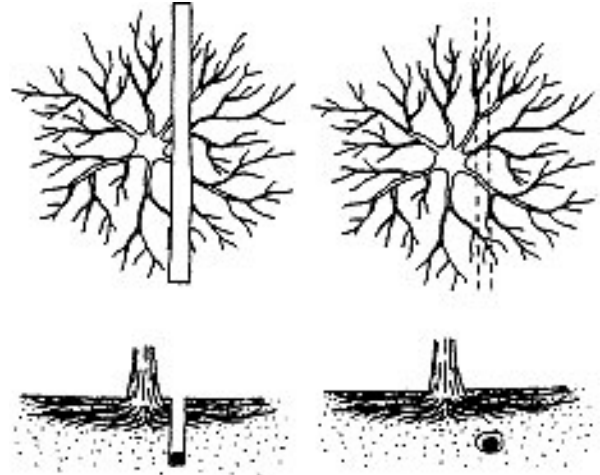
Trenching vs. Tunneling. Trenching near a tree (left) can kill almost half its roots. A tunnel or boring (right) in the same place will do virtually no damage to the tree. Source: Missouri Extension
